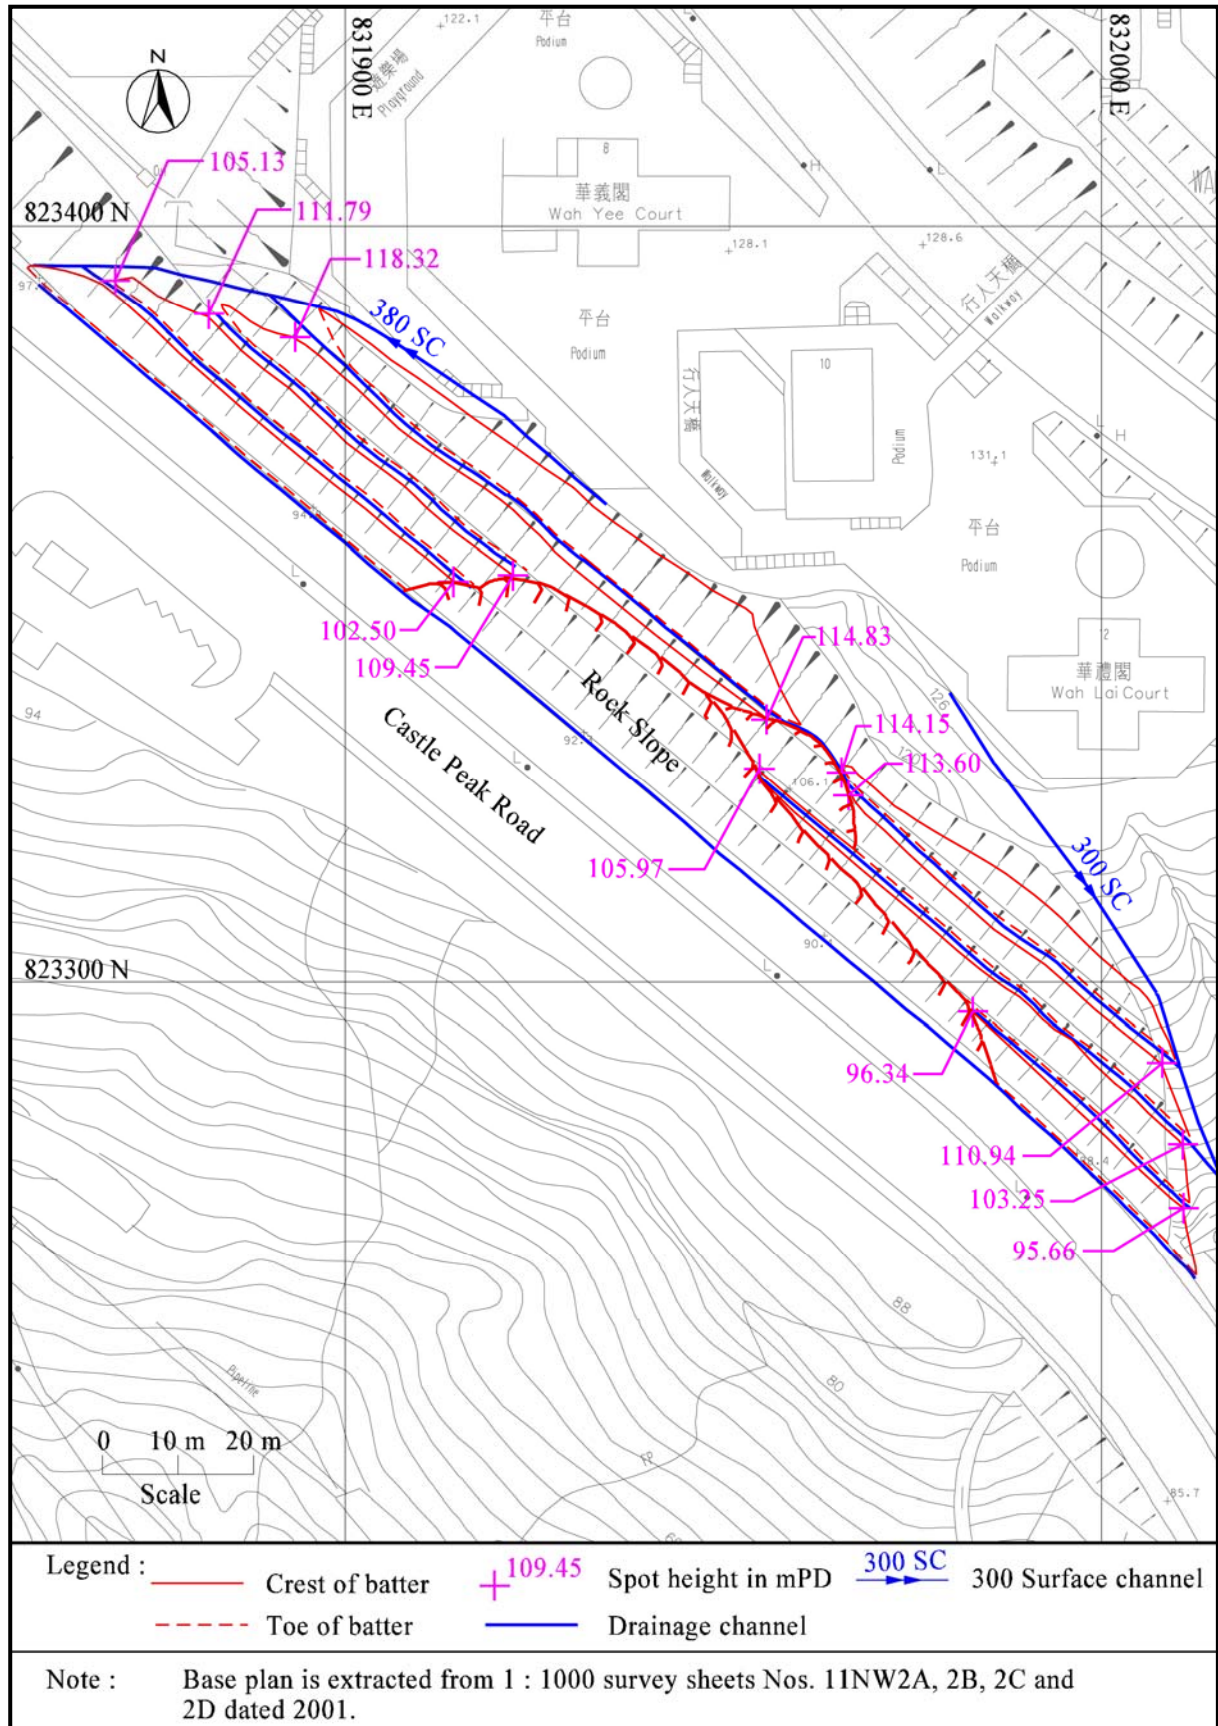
Slope Drainage Plan Based on Information Extracted from Site Formation Plan Submitted to the BOO by Wong Ouyang & Associates (1978)
